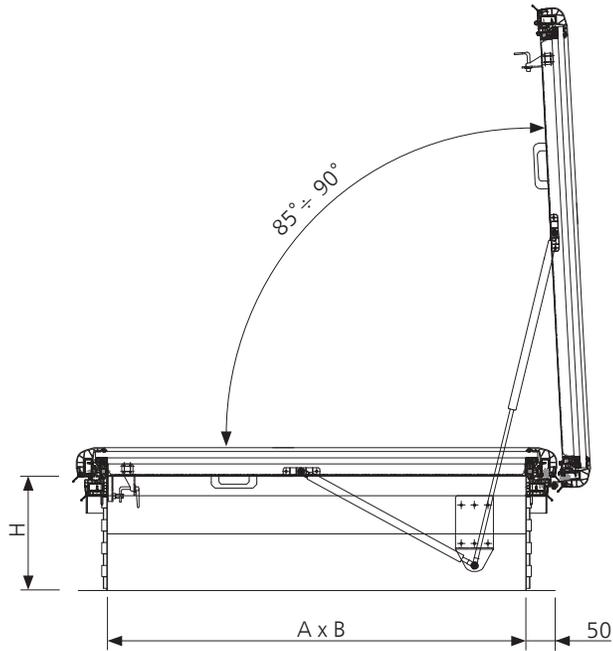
Section B-B through mcr ULTRA THERM C roof hatch in open position, dimensions in mm
